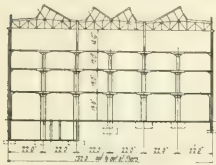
ELEVATION OF PATTERN STORAGE BUILDING
